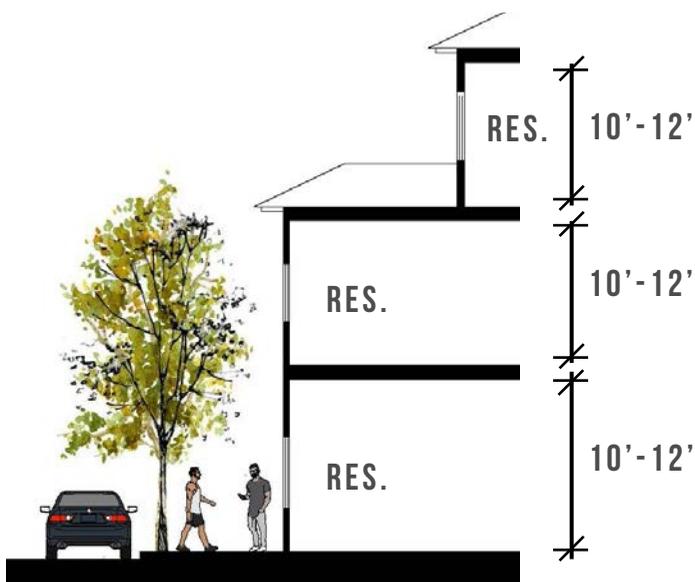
Example of standalone residential building that could occur on First Street or San Antonio Road Districts.
